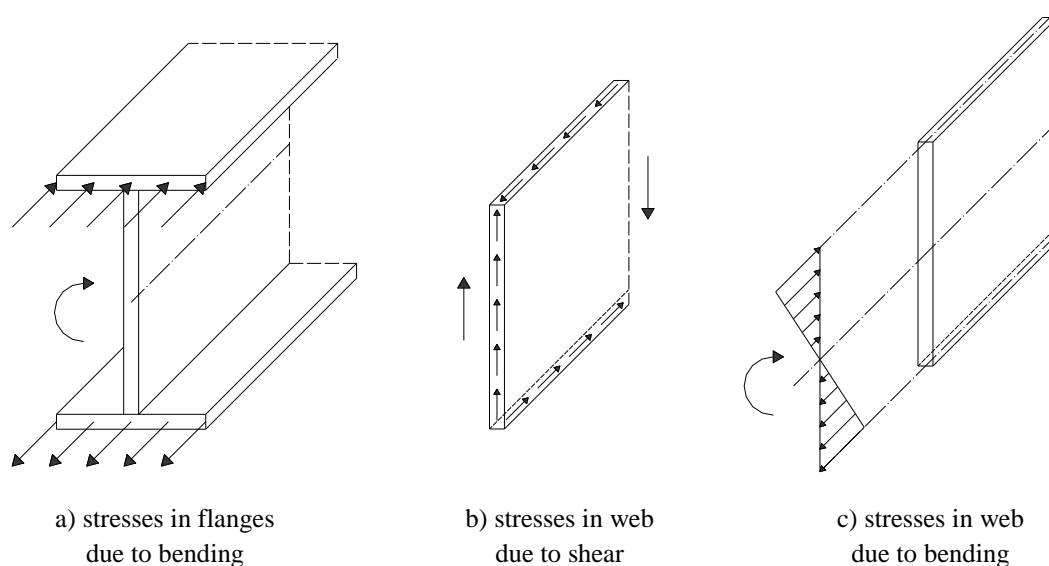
Stresses in a plate girder (Vila Real, 2010)
